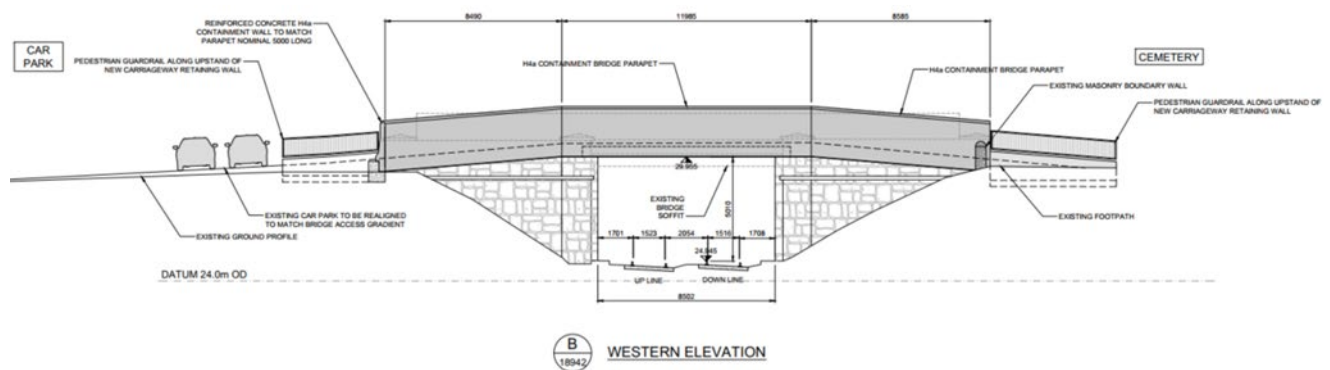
Glasnevin Cemetery Road Bridge (OBO10) Section – Facing East
